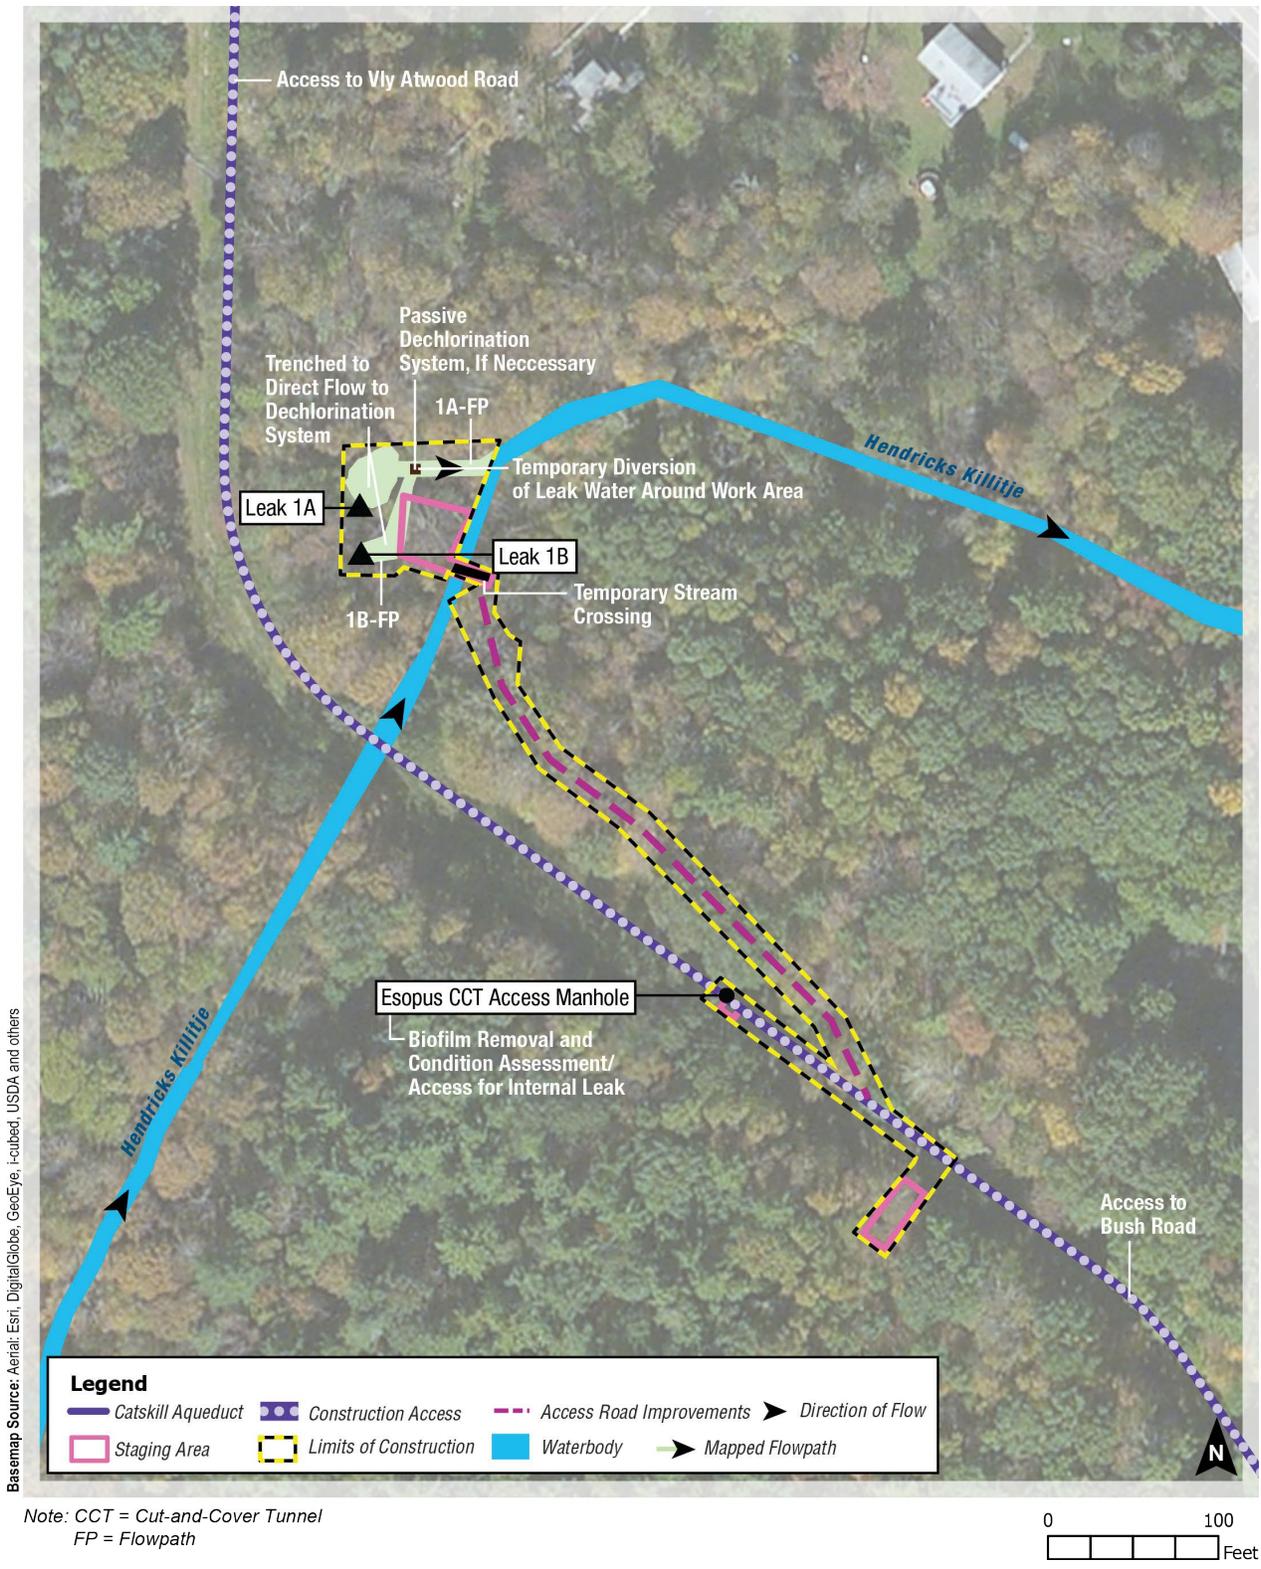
Site Plan for Leaks 1A and 1B - Vly Atwood Road Study Area
